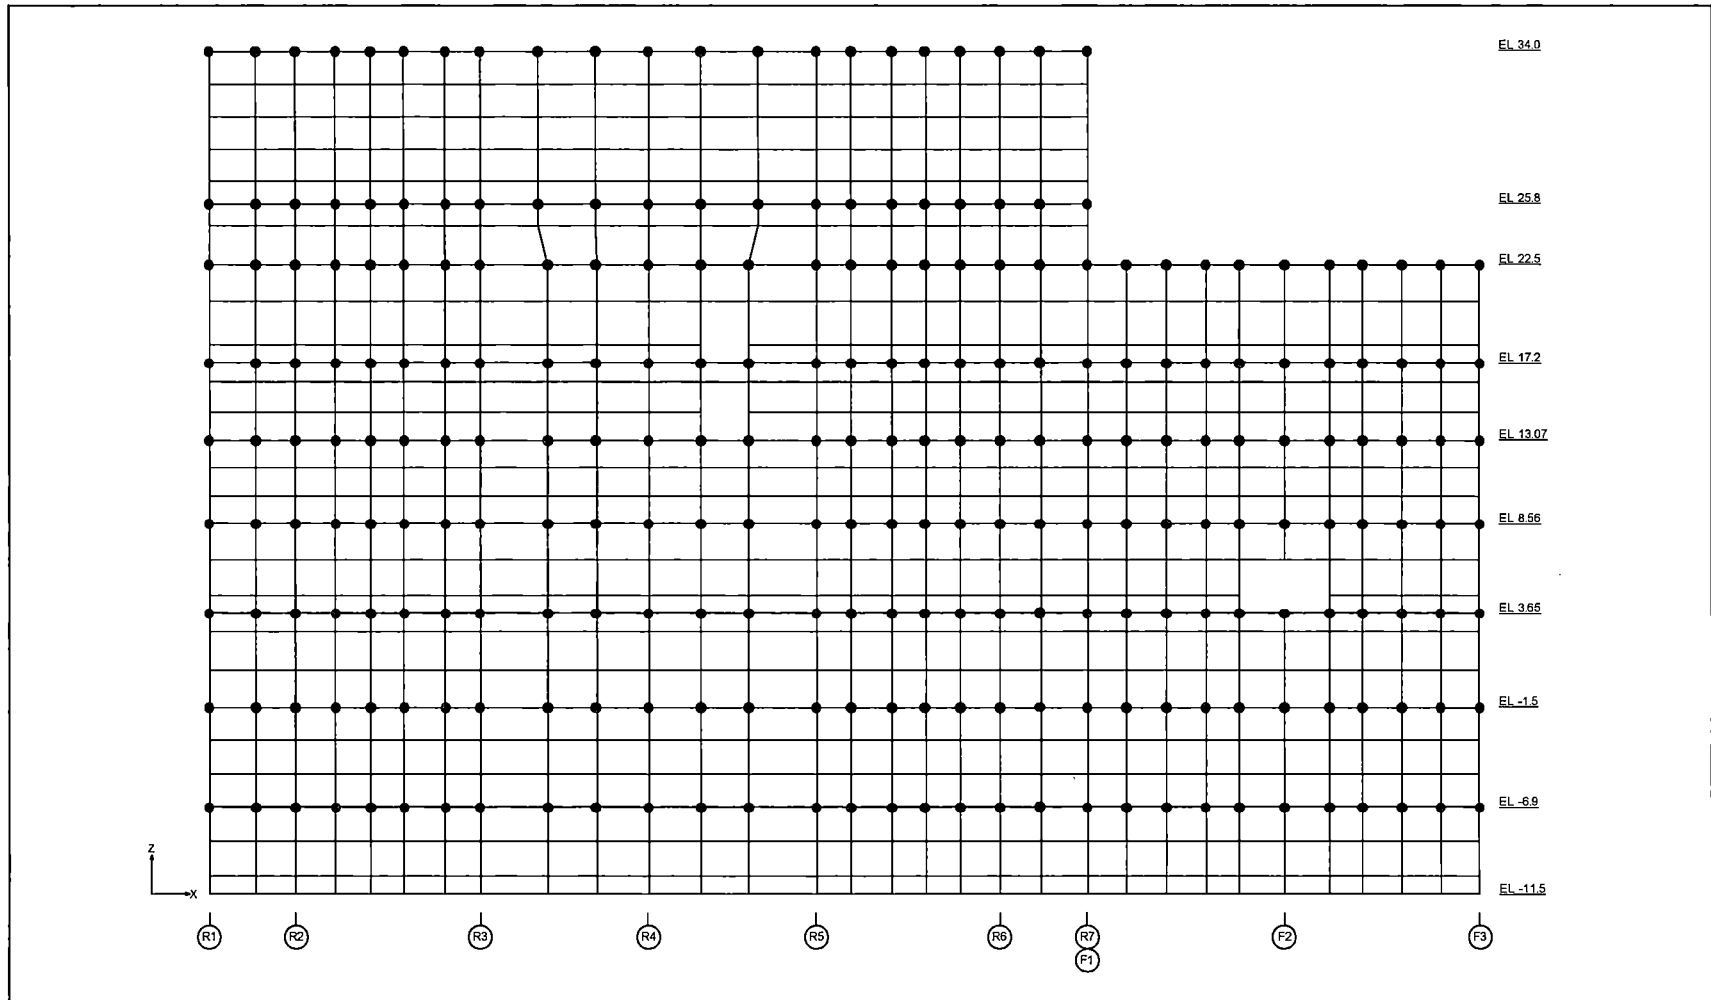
Application of Overturning Moments to the External Wall on RG Column Line
